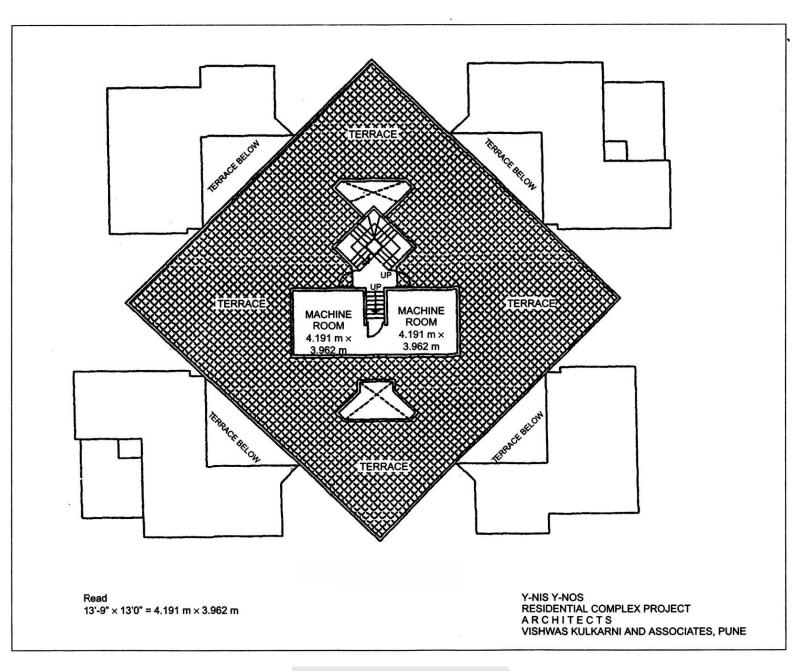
Y-NIS Y-NOS Terrace Floor Plan
